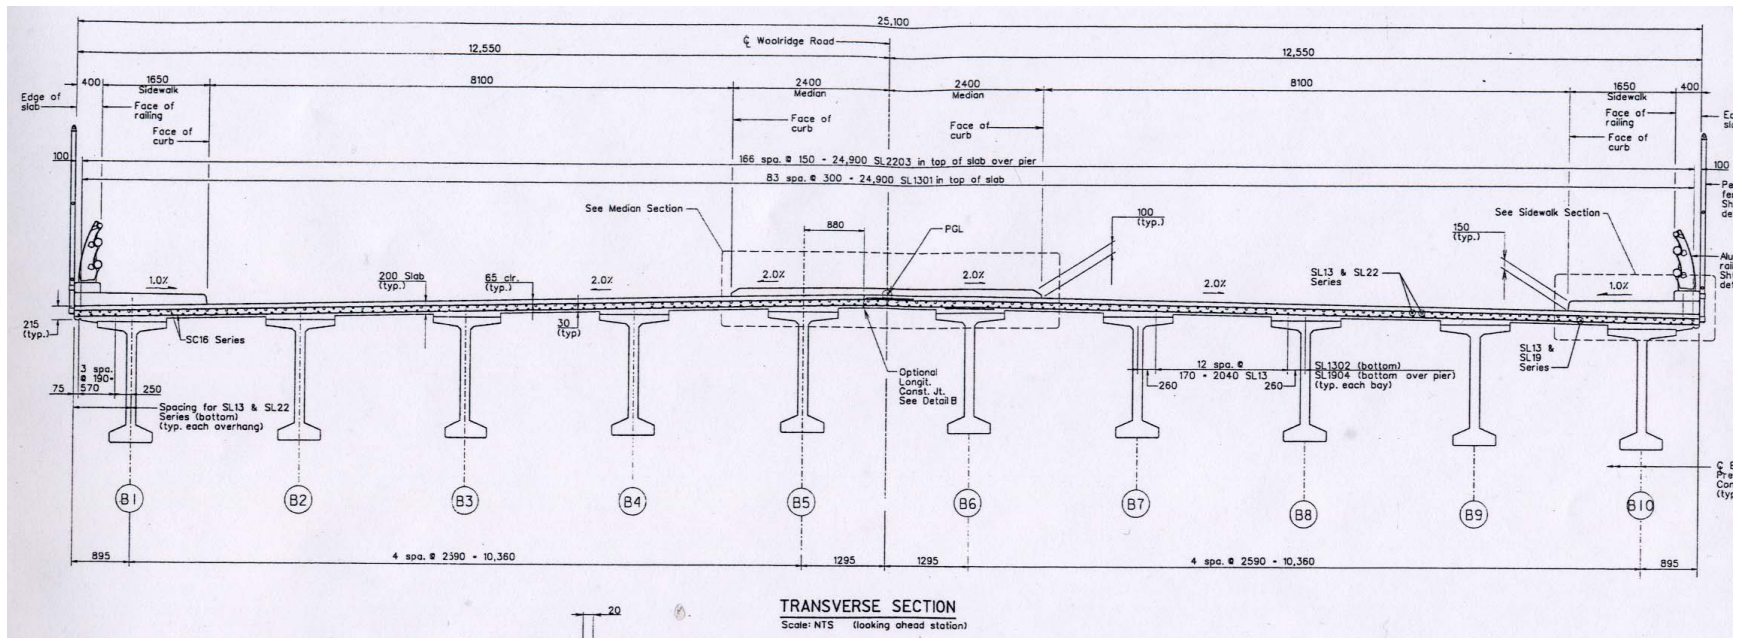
The cross section of the prestressed concrete bridge superstructure [Maday, 2002]. All dimensions are in mm.
